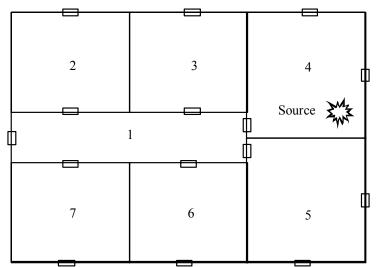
Floor plan of the hypothetical office suite. Room 1 is a hallway, room 2 is a common room, and rooms 3 to 7 are each assigned an occupant. The small open rectangles represent closed exterior windows and open doors between the offices and the hallway. The volume of each room is $\sim 80 \text{ m}^3$.
